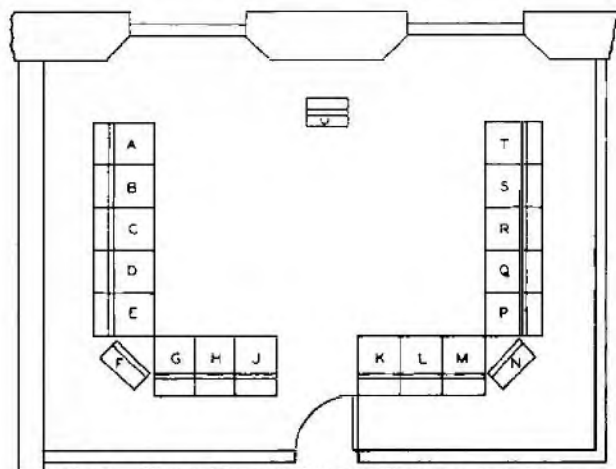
FLOOR PLAN OF INLAND TRANSMISSION ROOM.
